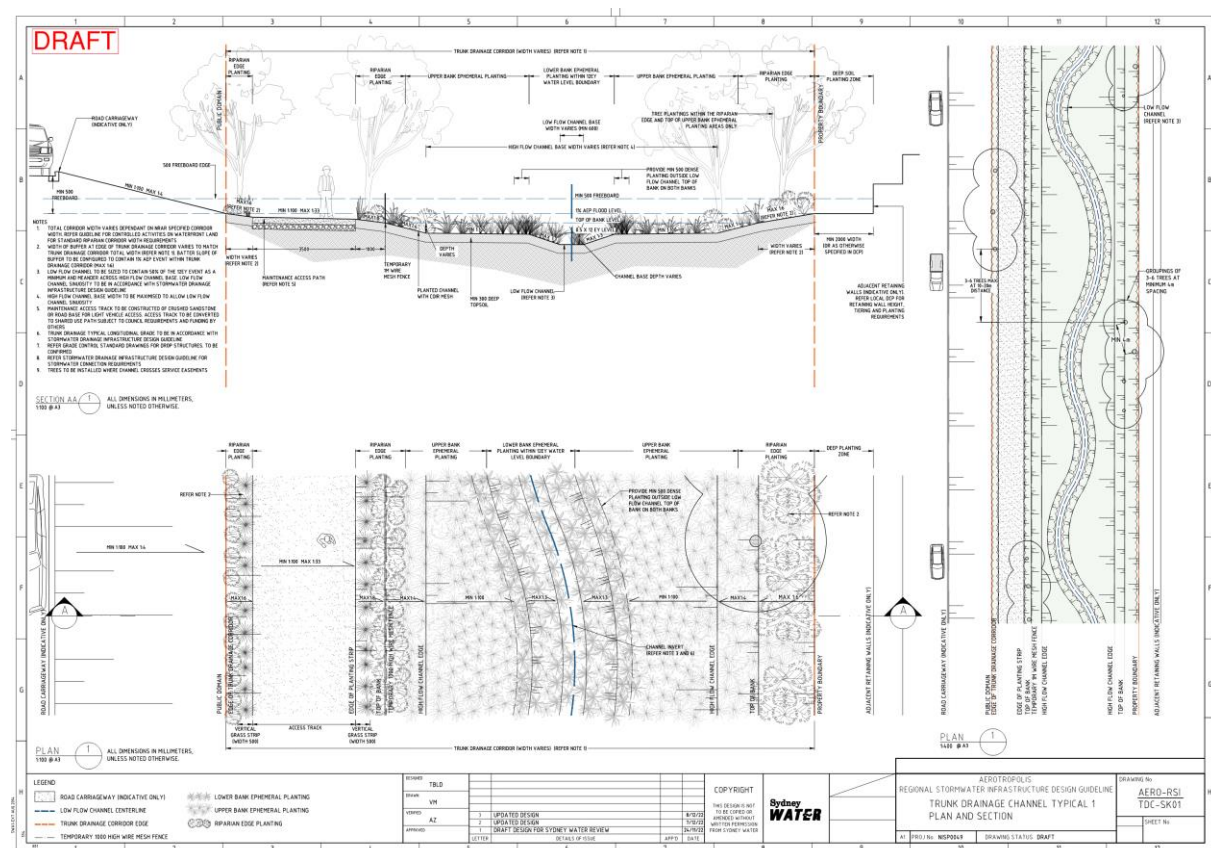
Sydney Water Trunk Drainage Standard Drawing
